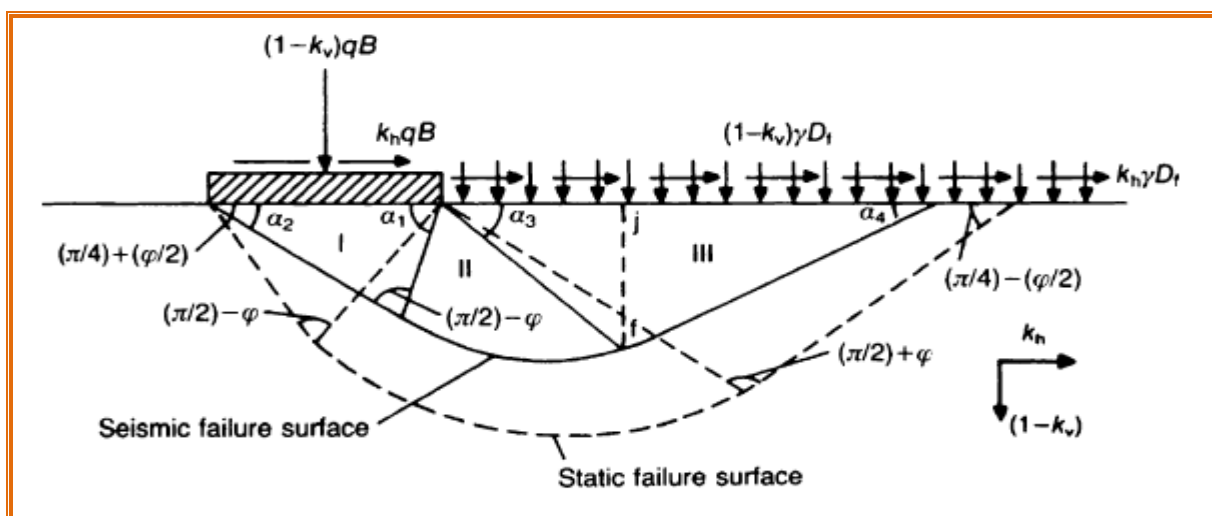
additional slide shear failure foundation due to seismic loading (J.A. Knappett, 2006)
